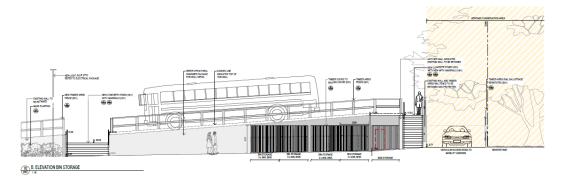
Elevation indicating the relationship between Bronte Park and the raised level bus zone (Source: Group GSA, Sections and Elevations L6001 E 19/10/2018).
